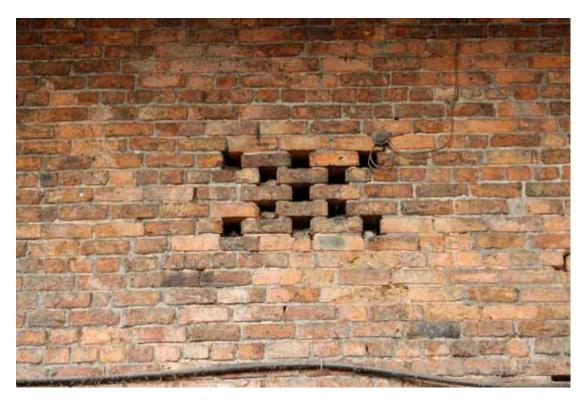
Detail of geometric style brick vent within the rear wall of Building 1
